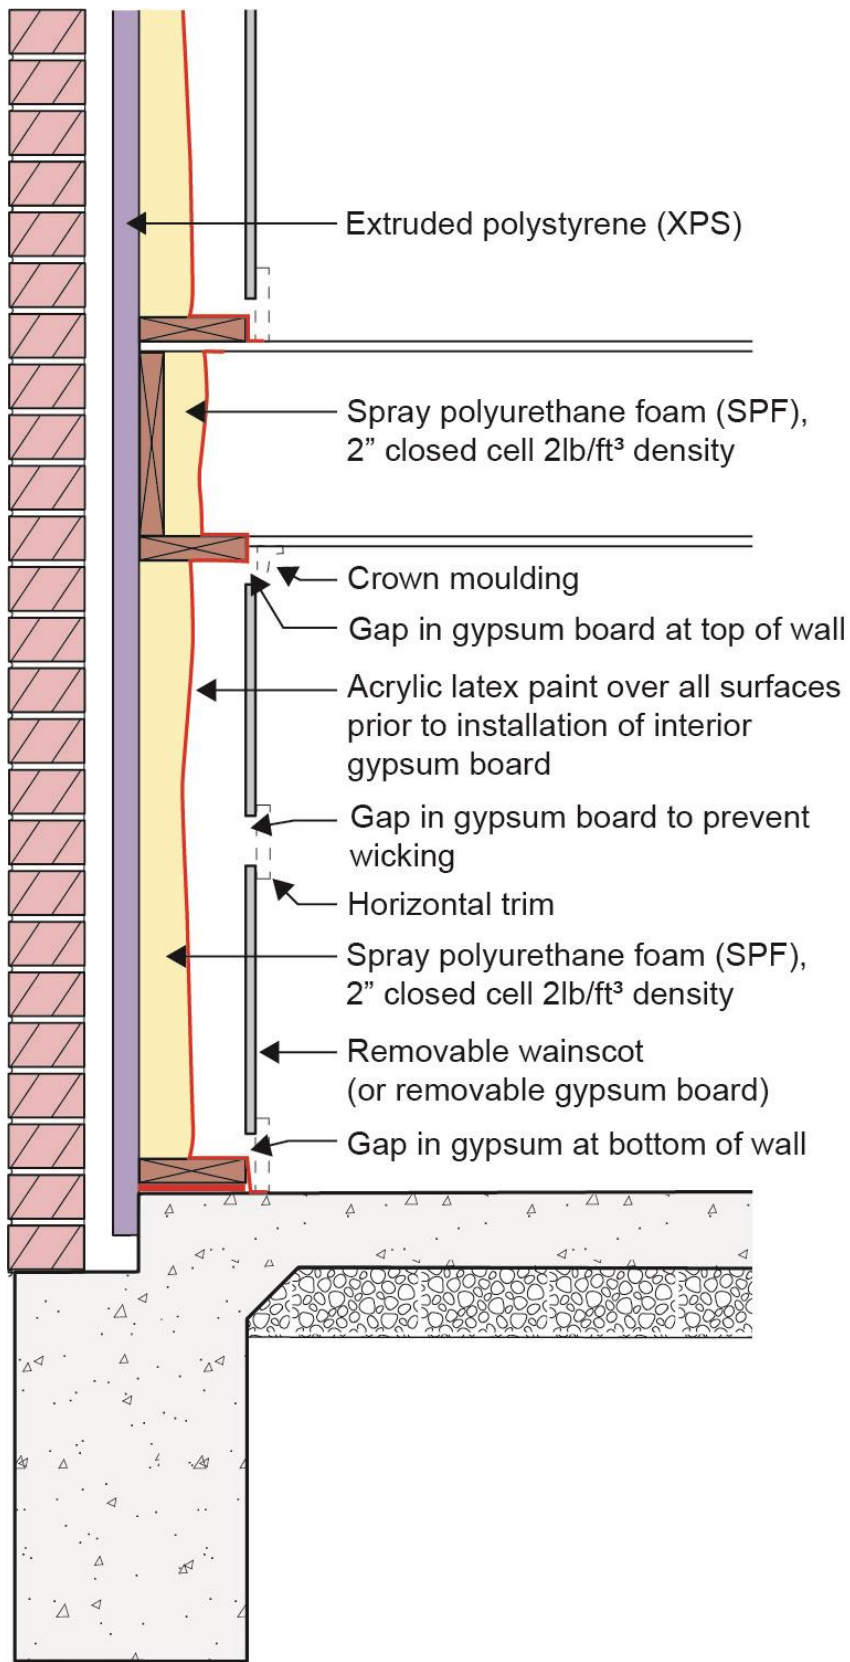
Elevated Slab With Wood Frame - Elevate the slab and use wood frame. No wood based sheathing. Closed cell SPF (2 lb/ft³ density). Coat everything with a water repellant coating such as acrylic latex paint.
